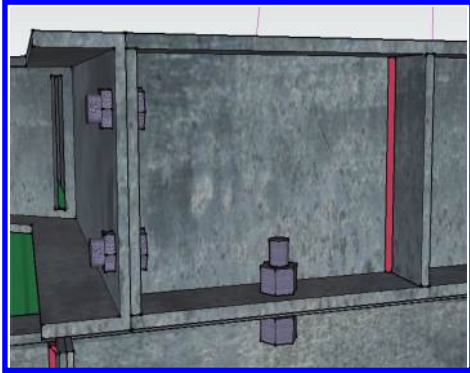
Bolt conjunction of inner wall lobe and lateral wall.
